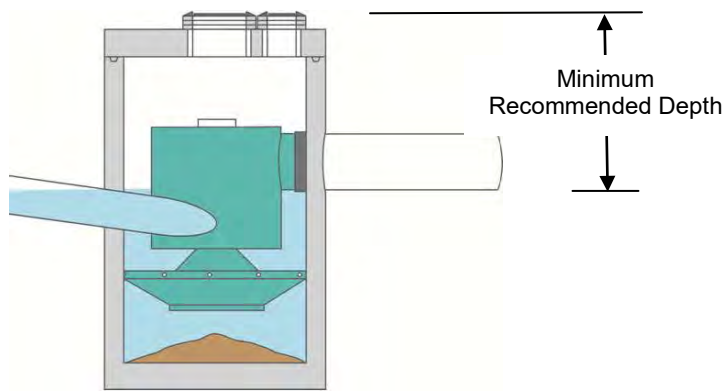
Minimum Recommended Design Depth from Rim to Invert of the Outlet Pipe
